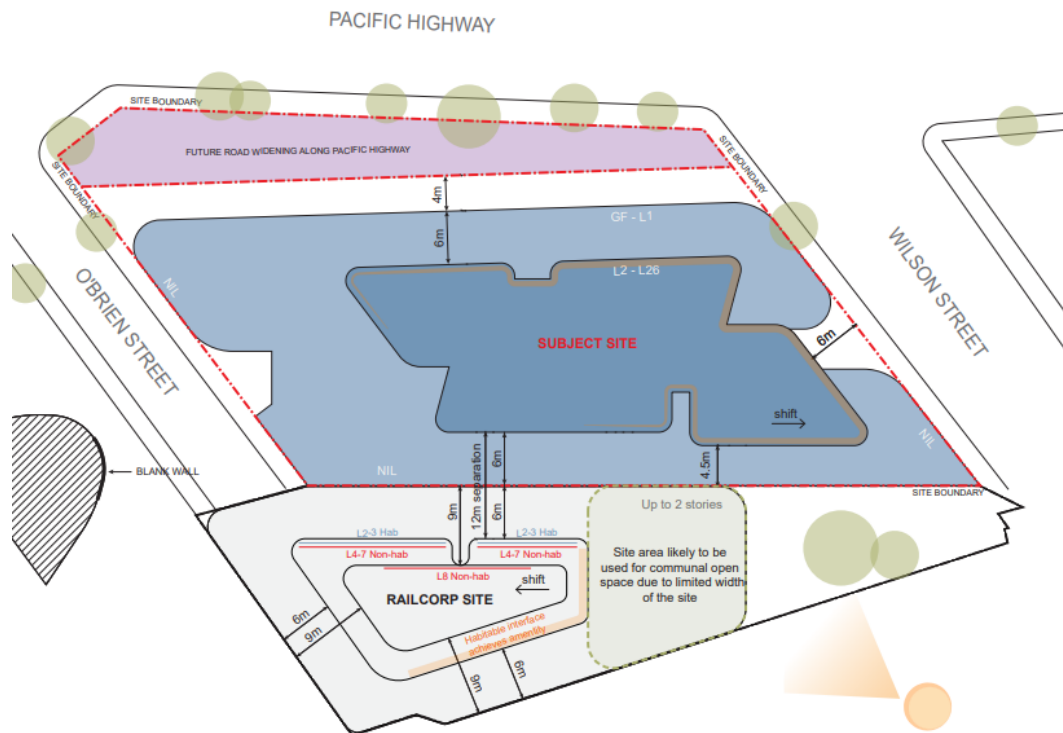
Built Form Concept showing subject site and adjoining eastern site with appropriate setbacks. (Source: PBD Architects)
